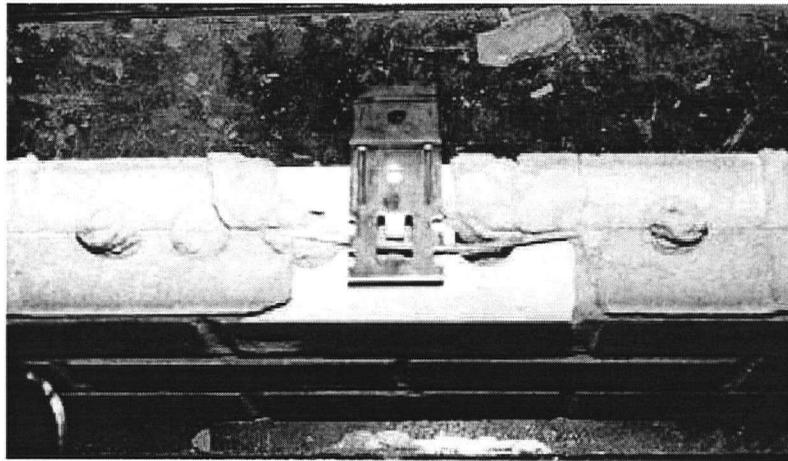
Photograph of a failed specimen with an SMP 11 plate with horizontal wire bed joint reinforcement.
